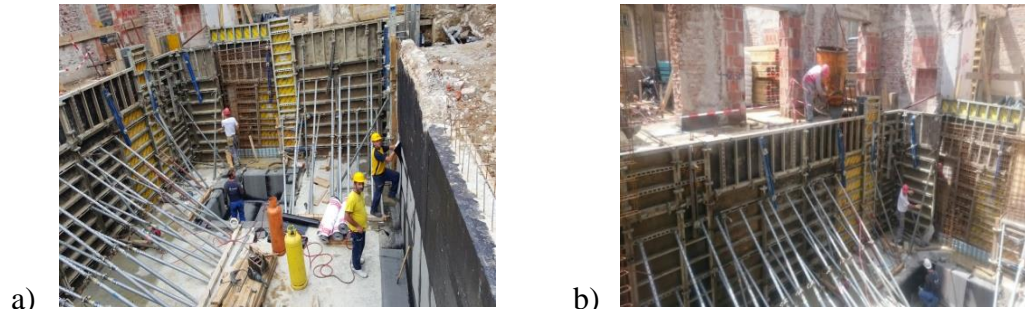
a) formwork and shuttering props are set up in difficult conditions for performing the works b) carefully installation of concrete into the formwork of the walls
